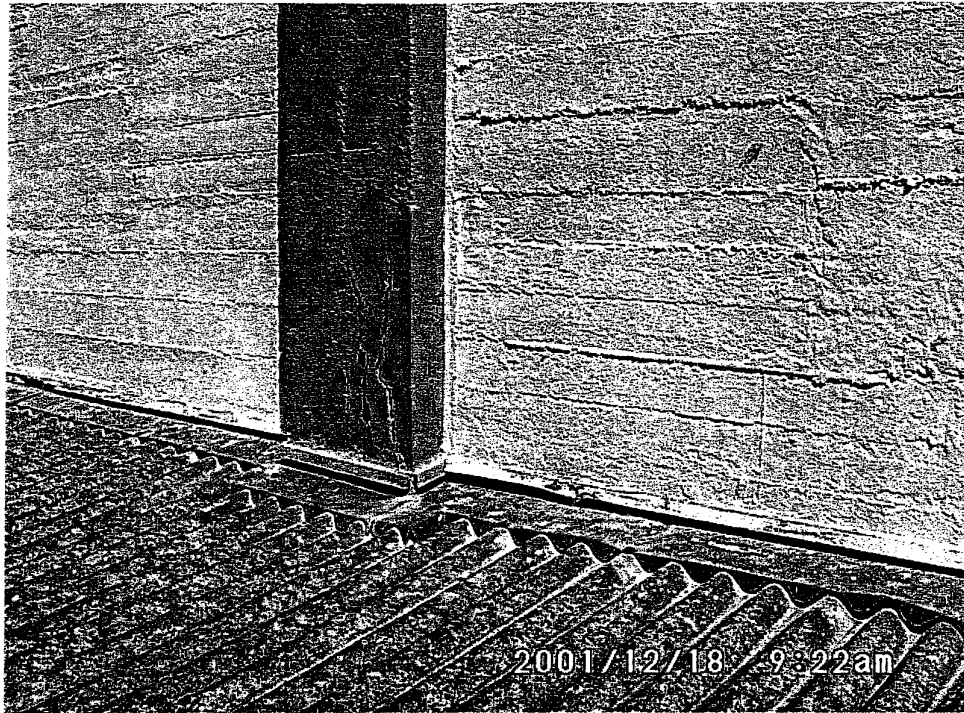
Cracked and drummy area on column, womens change rooms
